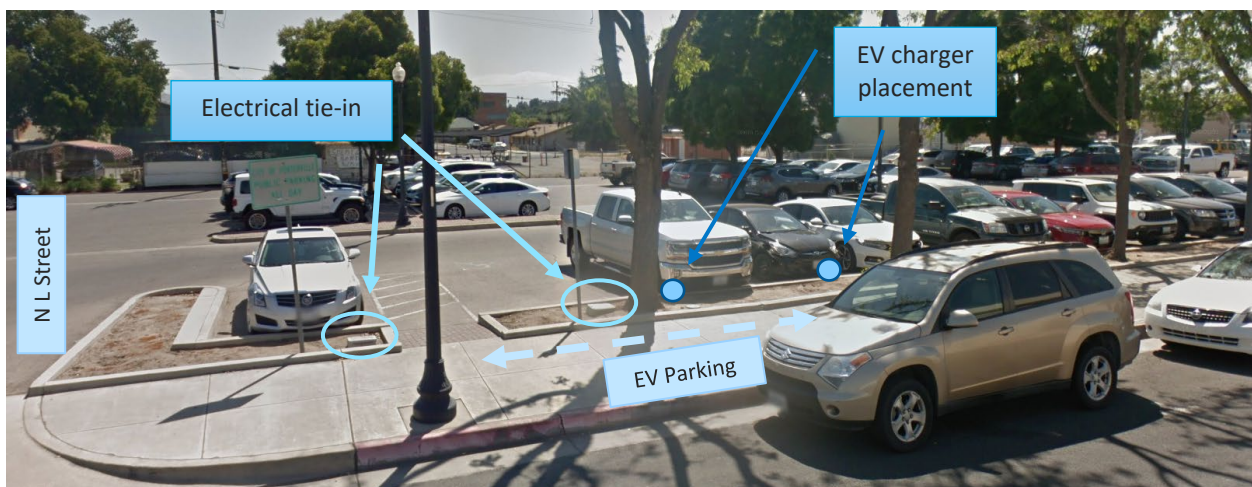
Site location for EV charger placement – Downtown Parking Lot in Porterville
